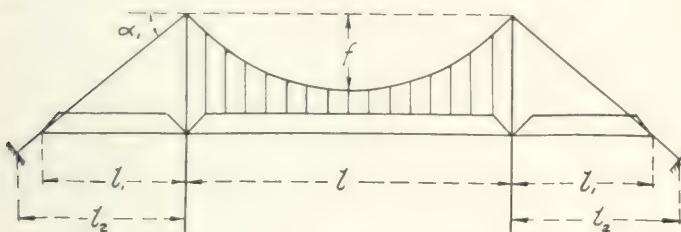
Two-hinged Stiffening Truss with Straight Backstays.
